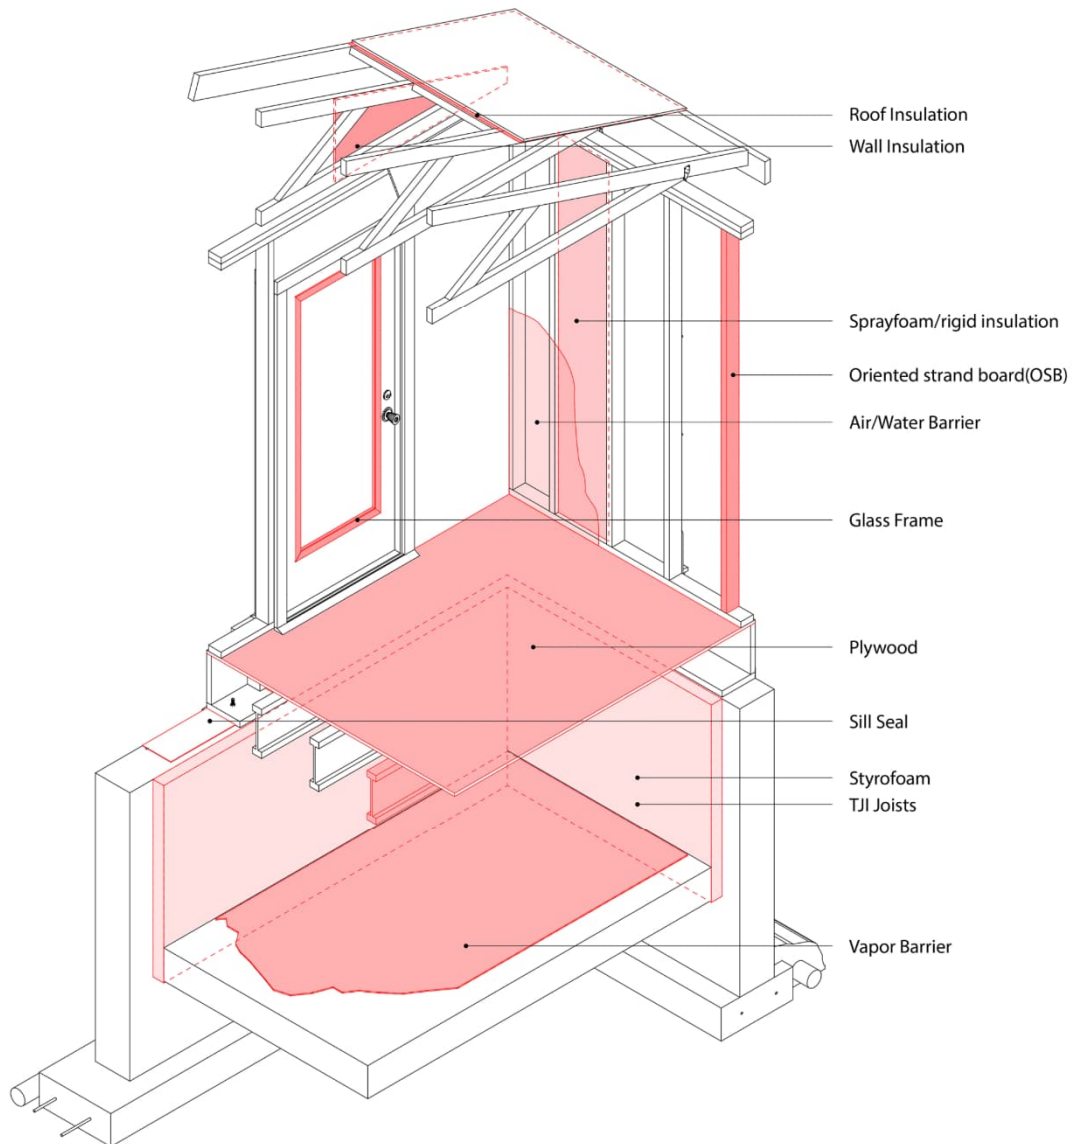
Xing, Jiayi and Ducharme, Olivier; Plastic in Light Frame Wood Construction.
